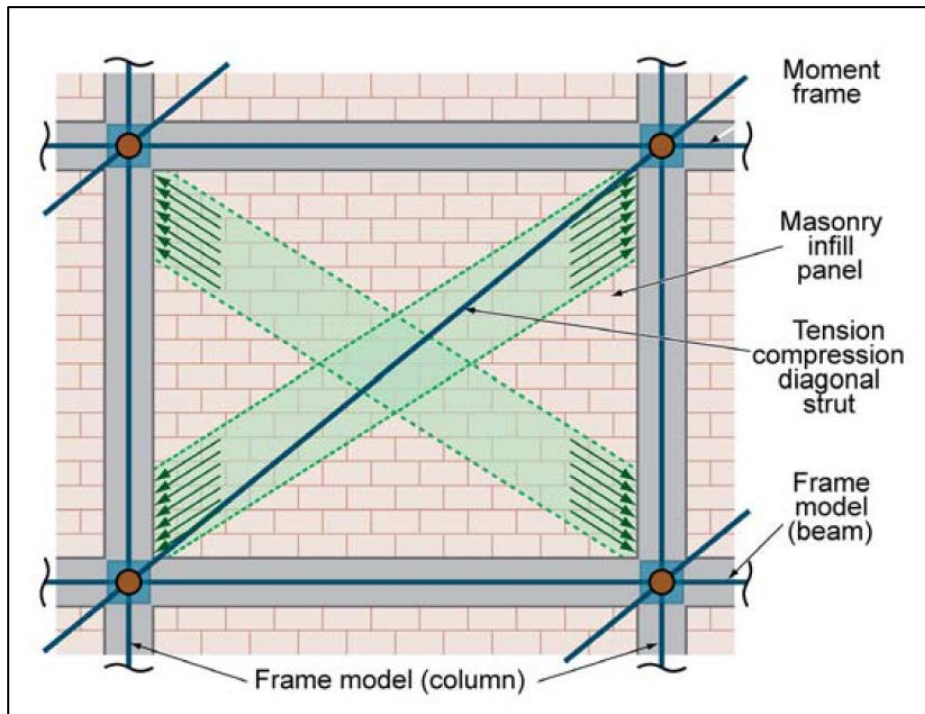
infill wall panel and model (Deierlein, 2010).
